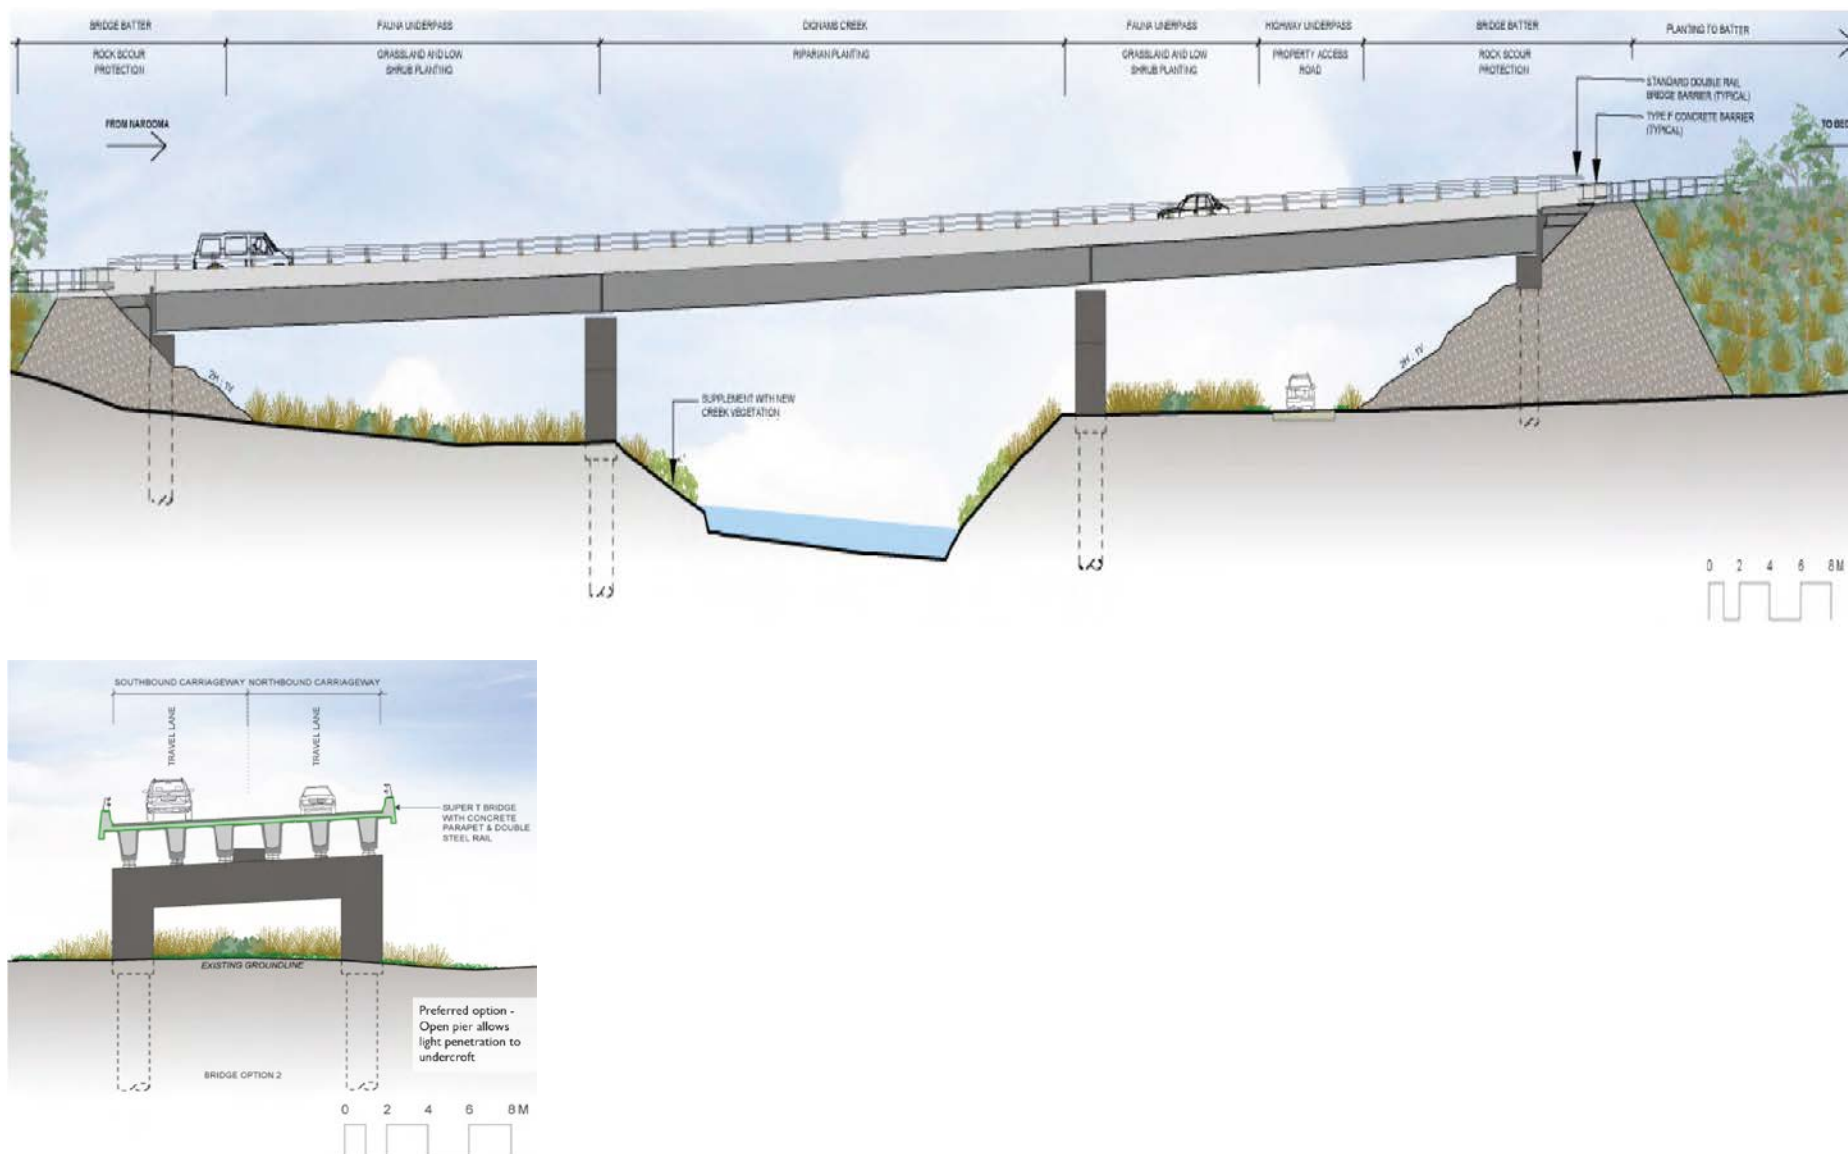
Cross section of the Dignams Creek Bridge (SMM, 2013)
